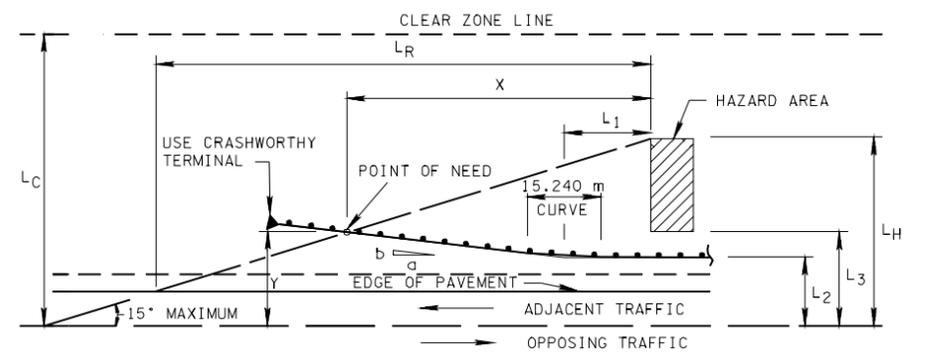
APPROACH BARRIER LAYOUT FOR OPPOSING TRAFFIC
